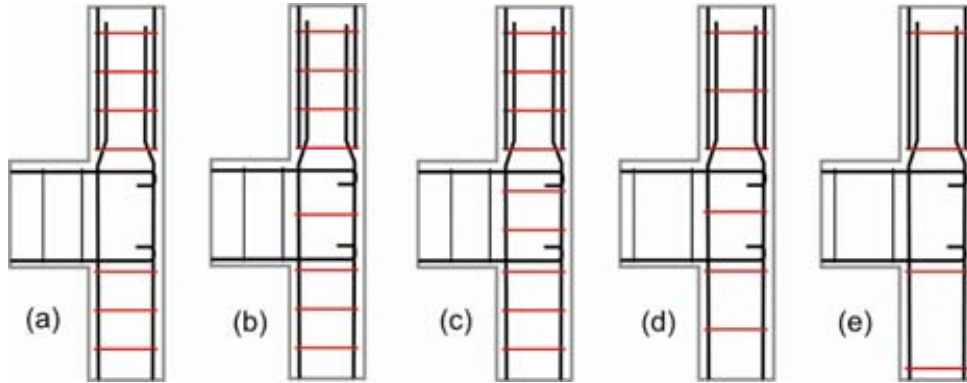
Schematic illustrations of joint stirrups in relation to the column stirrups and pre-1970s design assumptions: a-b) Joint neglected or considered as construction joint; c-e) Joints were treated as part of column, therefore quantity of joint stirrups depended on column stirrup spacing and beam depth.
